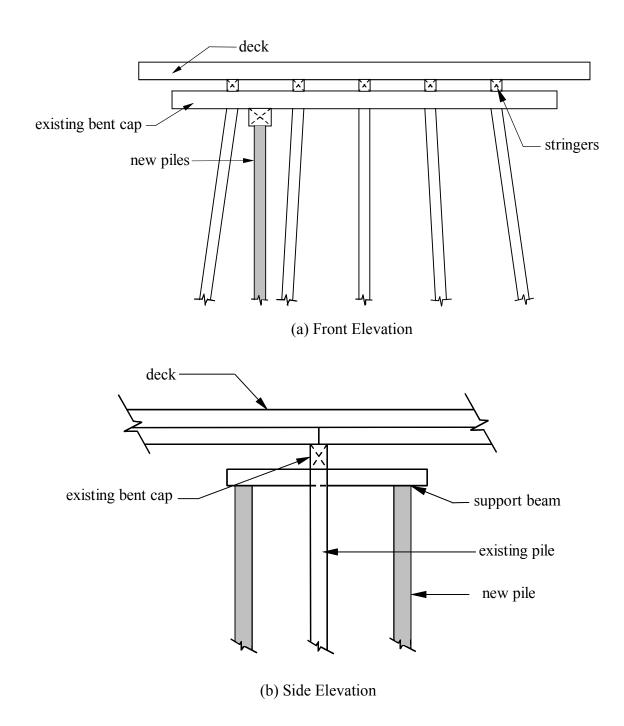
Pile Bent Strengthening with Supplemental Timber Piles.
